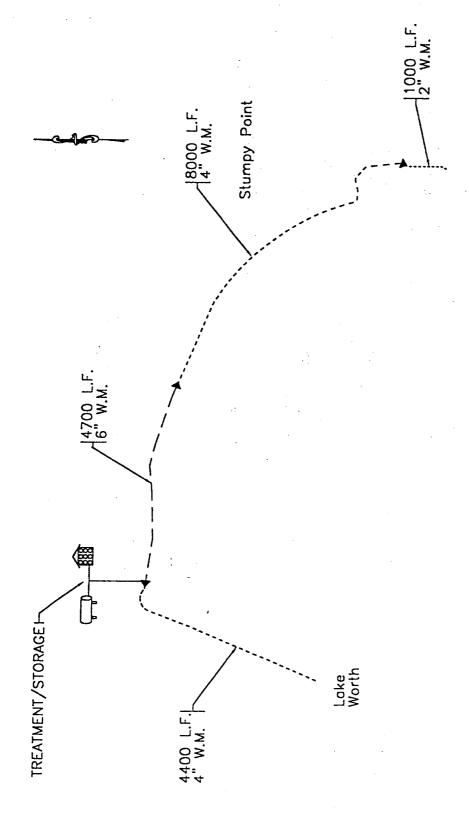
SYSTEM LAYOUT WITHOUT FIRE PROTECTION AND UTILIZATION OF THE SITE NEAR THE N.C. HWY. 264 AND SR 1100 INTERSECTION
